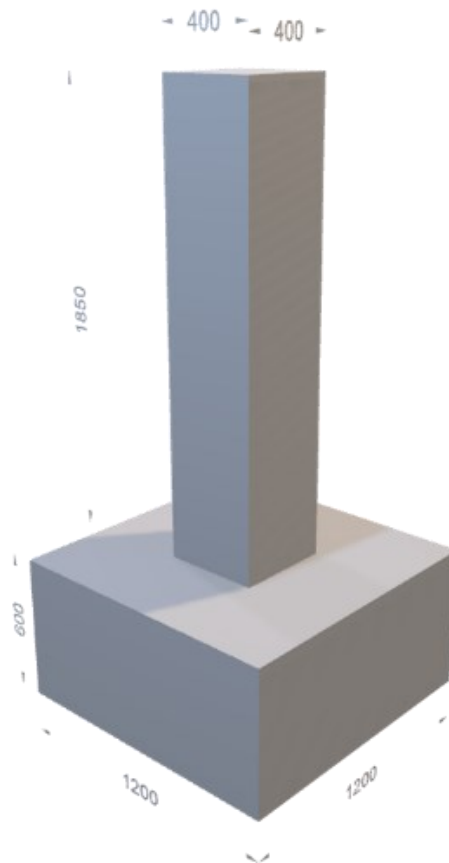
Dimensional details of test specimen (Unit: mm).
